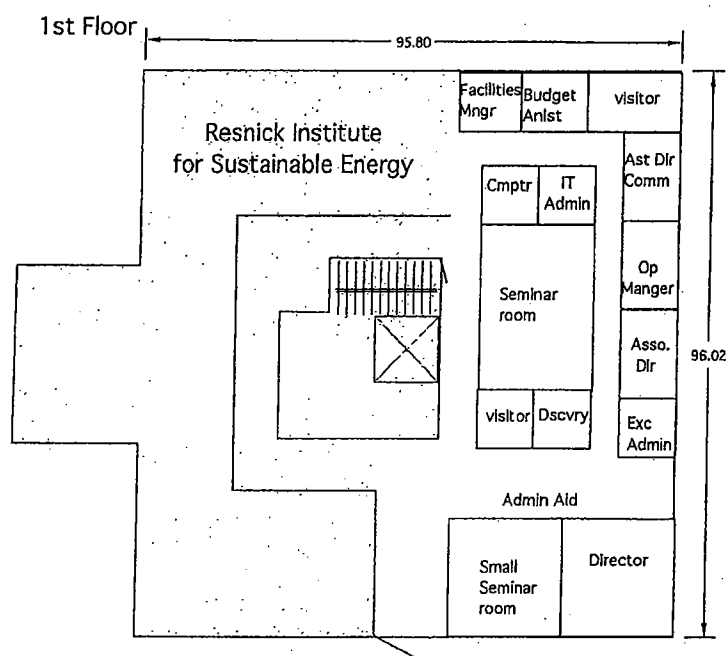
Conceptual layout of first floor of the Caltech Hub.
